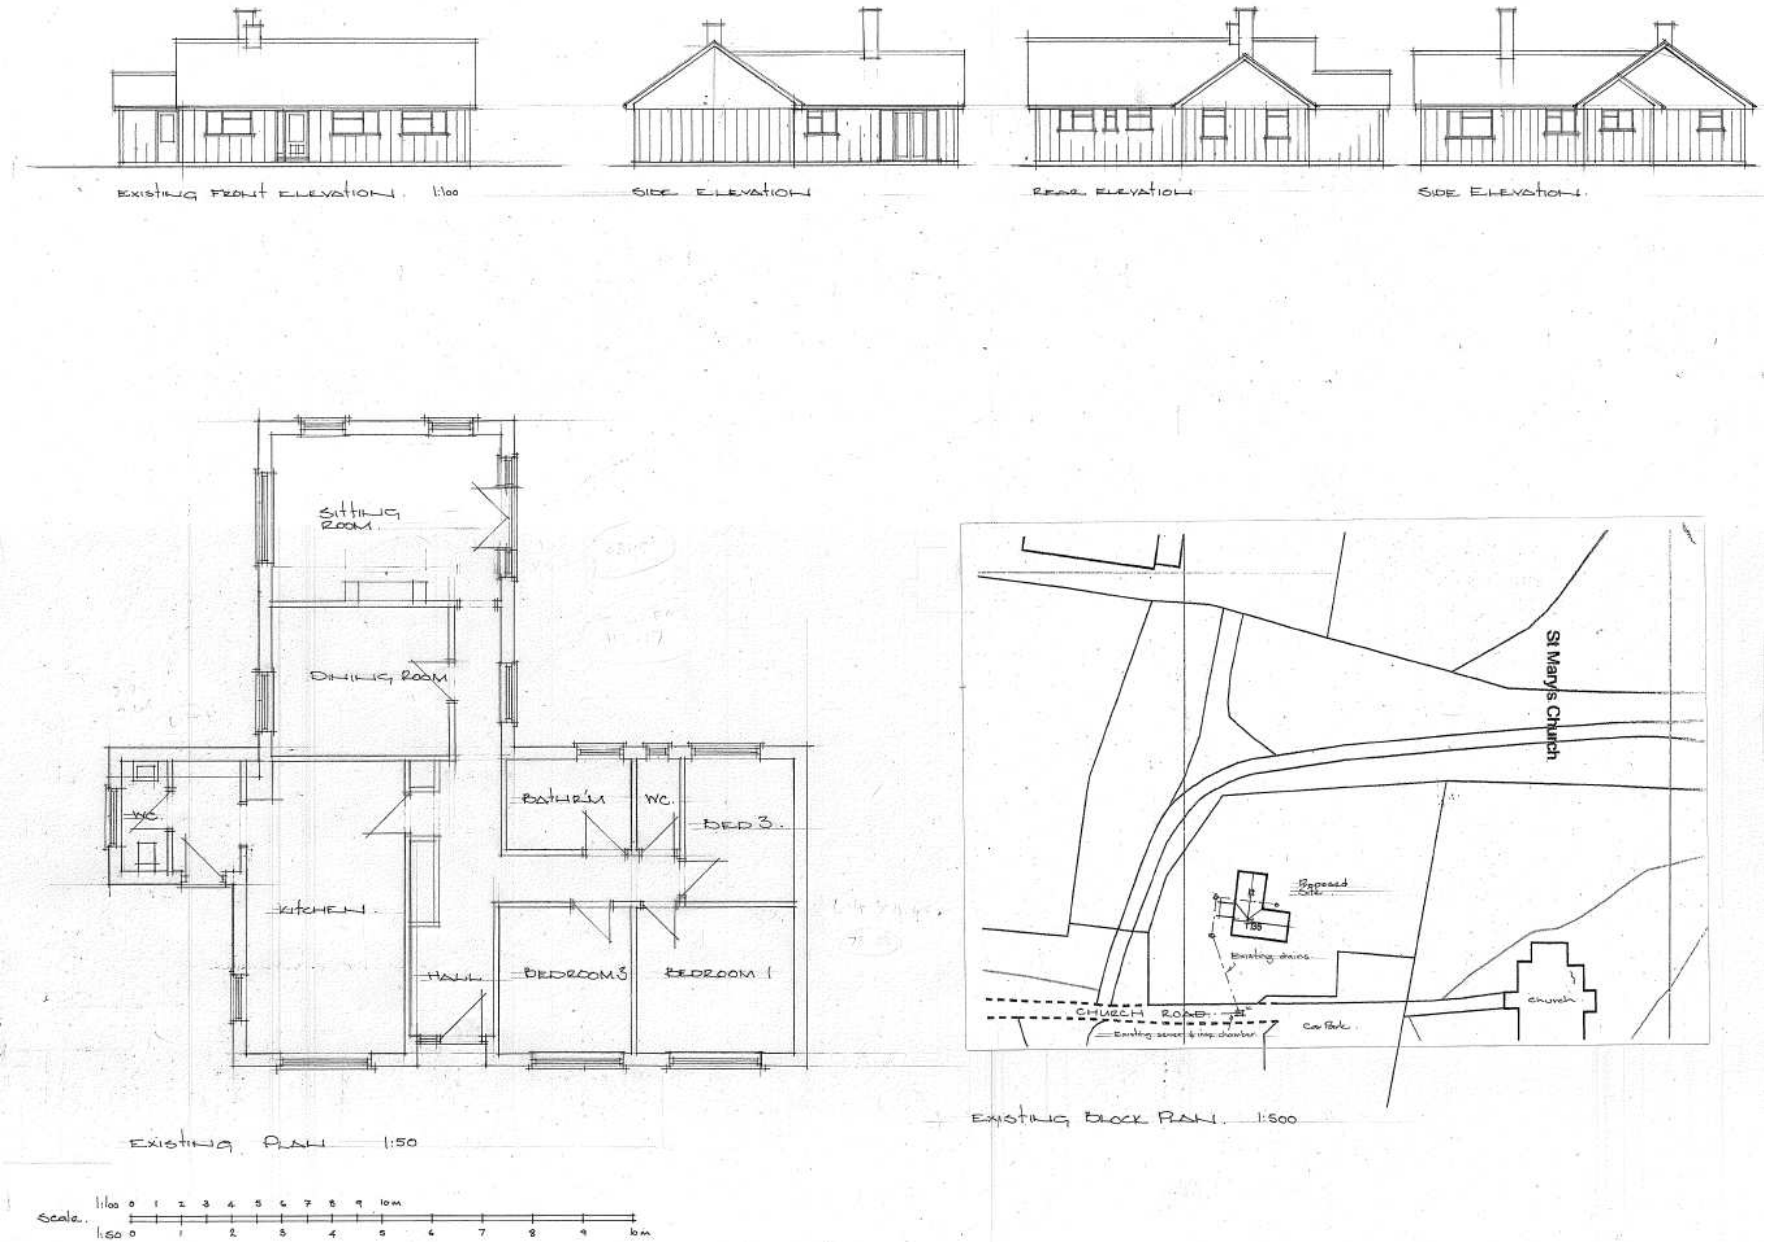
Plan and elevations of existing building (John Edgell, Charter Building Surveyor)
